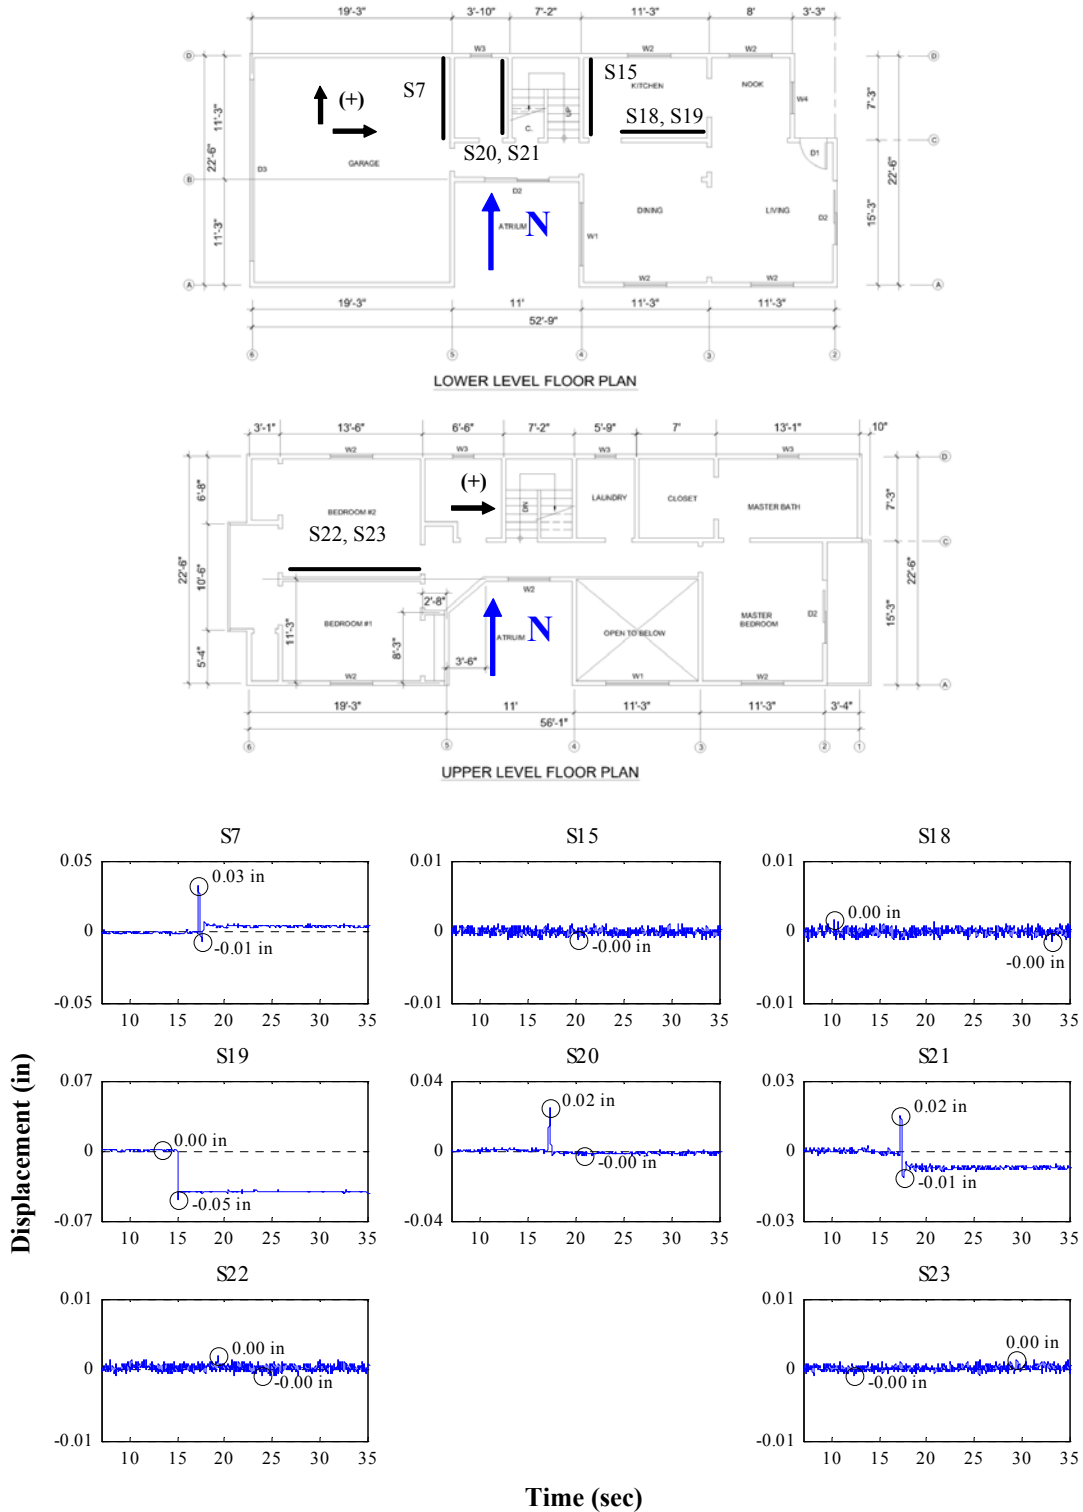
Wall deformations of internal walls for Test NWP1S01
